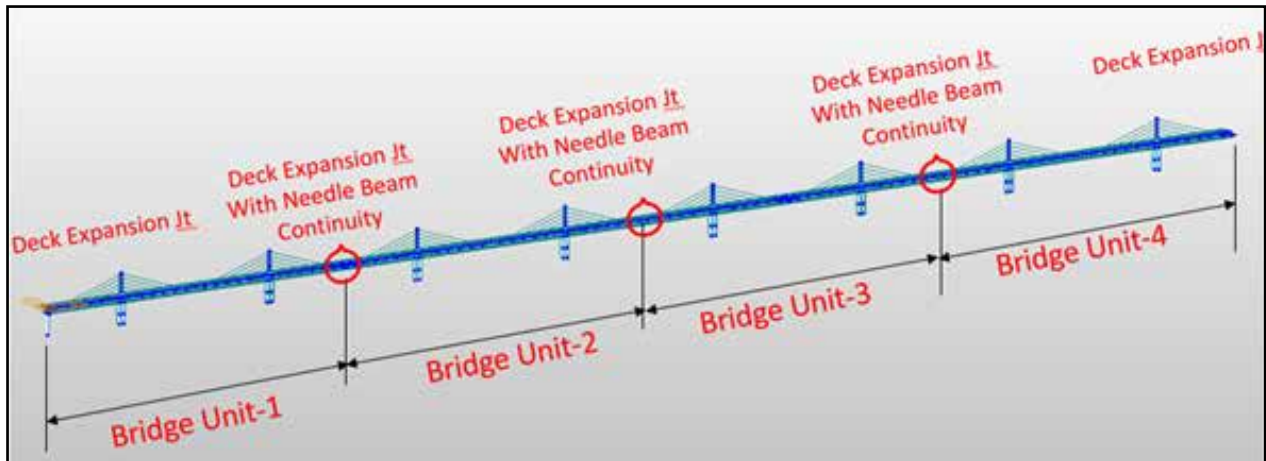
Multi-Span Extradosed Bridge (With All Equal Intermediate Spans having deck expansion joint in middle of span) -Arrah Chabra Bridge over river Ganga, Bihar
